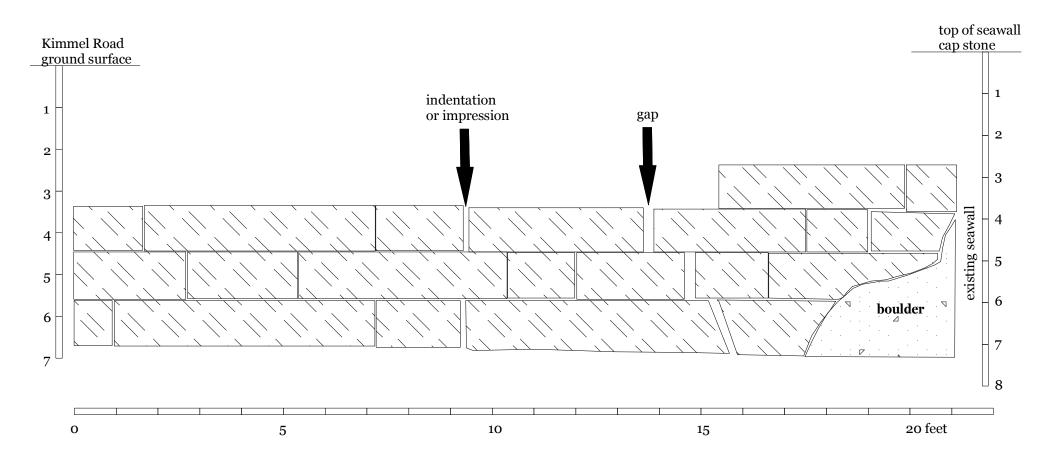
South face of the 1883 seawall, the former water side, found within the seawall foundation repair excavation.
